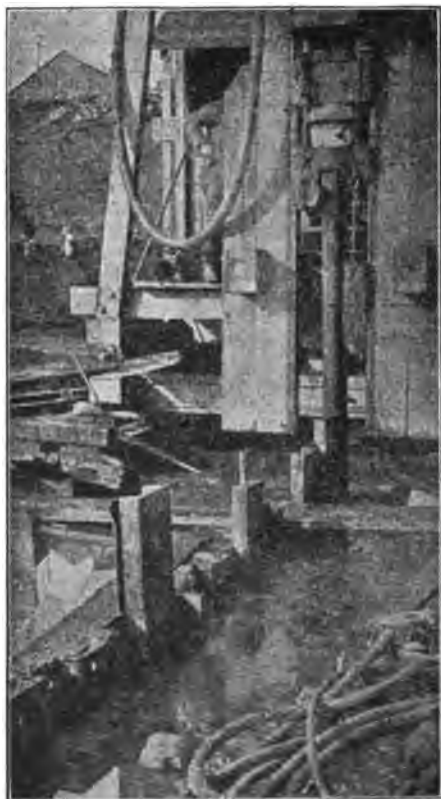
View Showing Arrangement for Driving Steel Sheet Piles.
